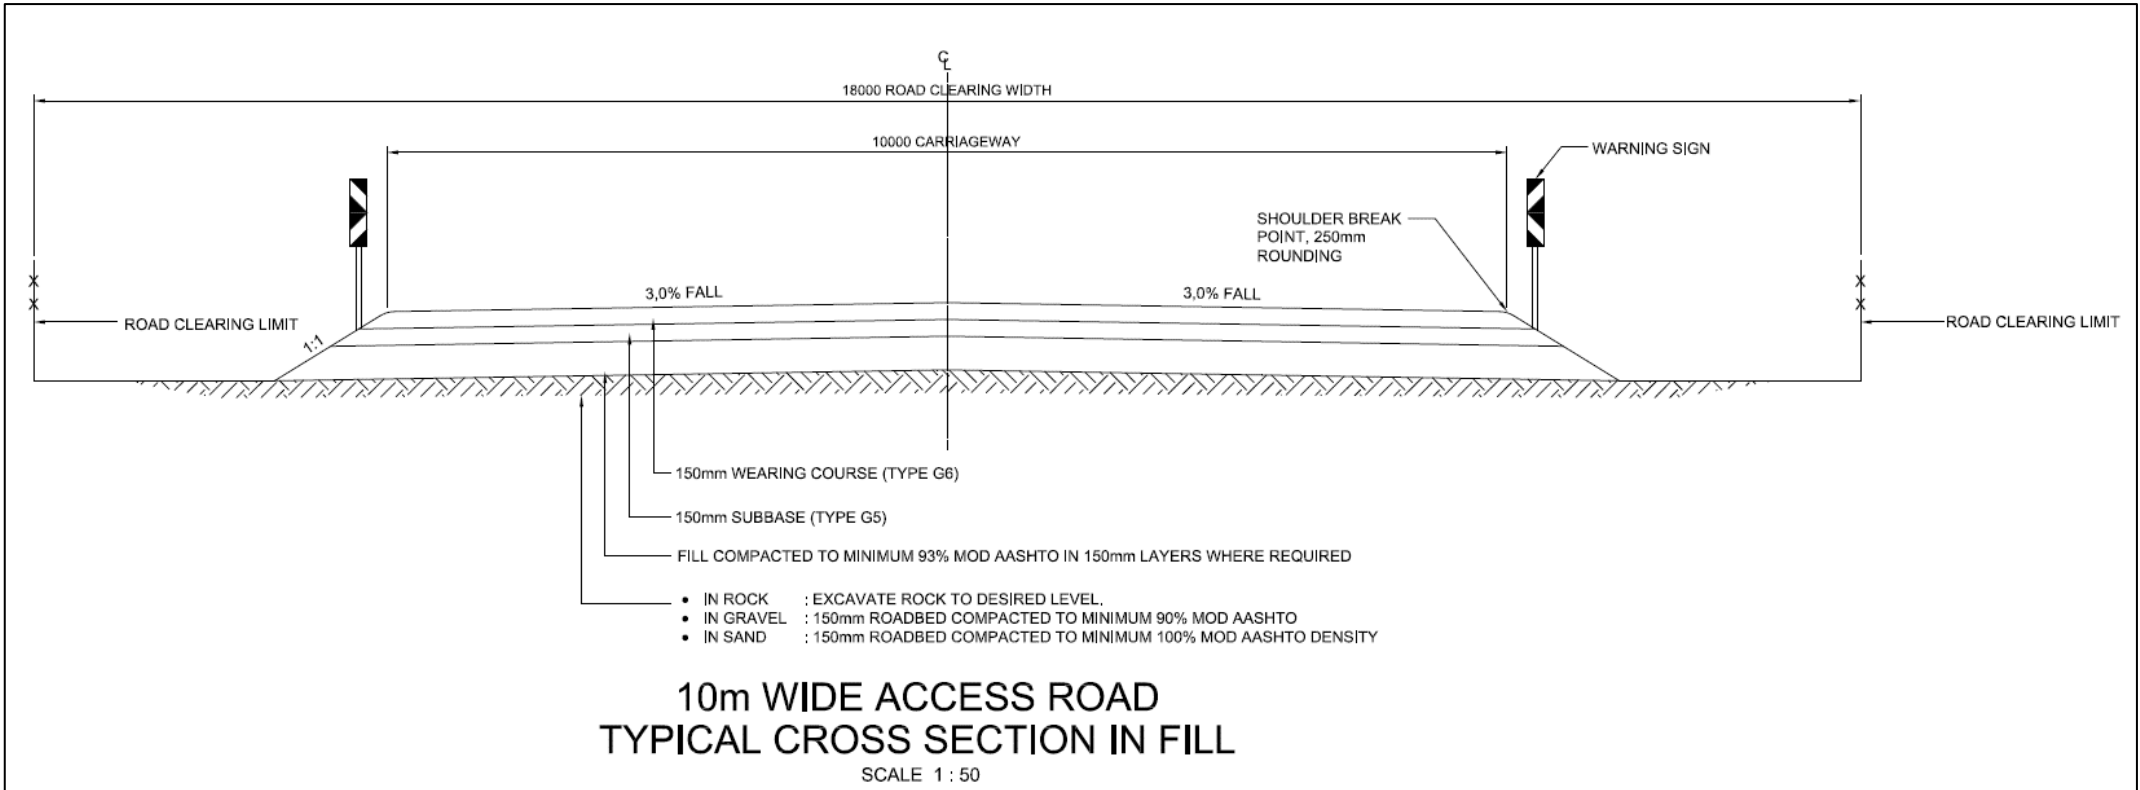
Access Road design fill drilling site engineering example (Source: Preliminary Drawings by Burmeister & Partners for REN, 2022).
